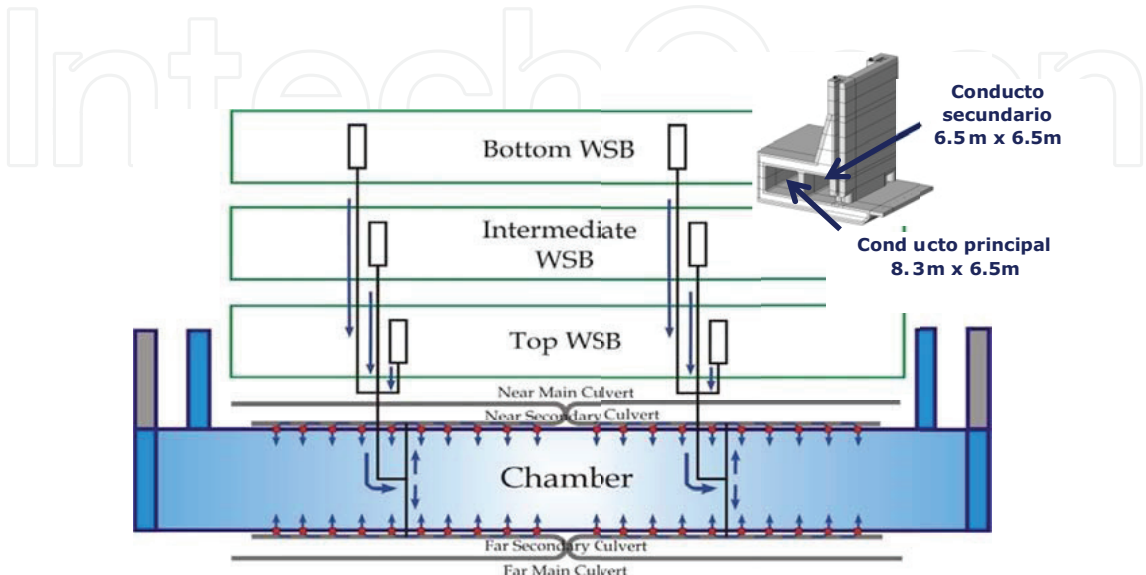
Bottom view of the main conduits (culvert) and water saving basins (WSB).
